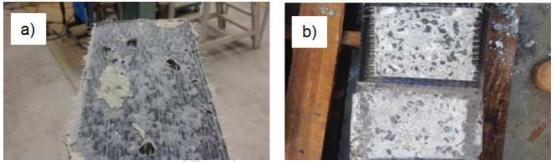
(a) Adhesive failure at BFRP/concrete interface of B330B, (b) Minimal damage to concrete substrate of B330B
